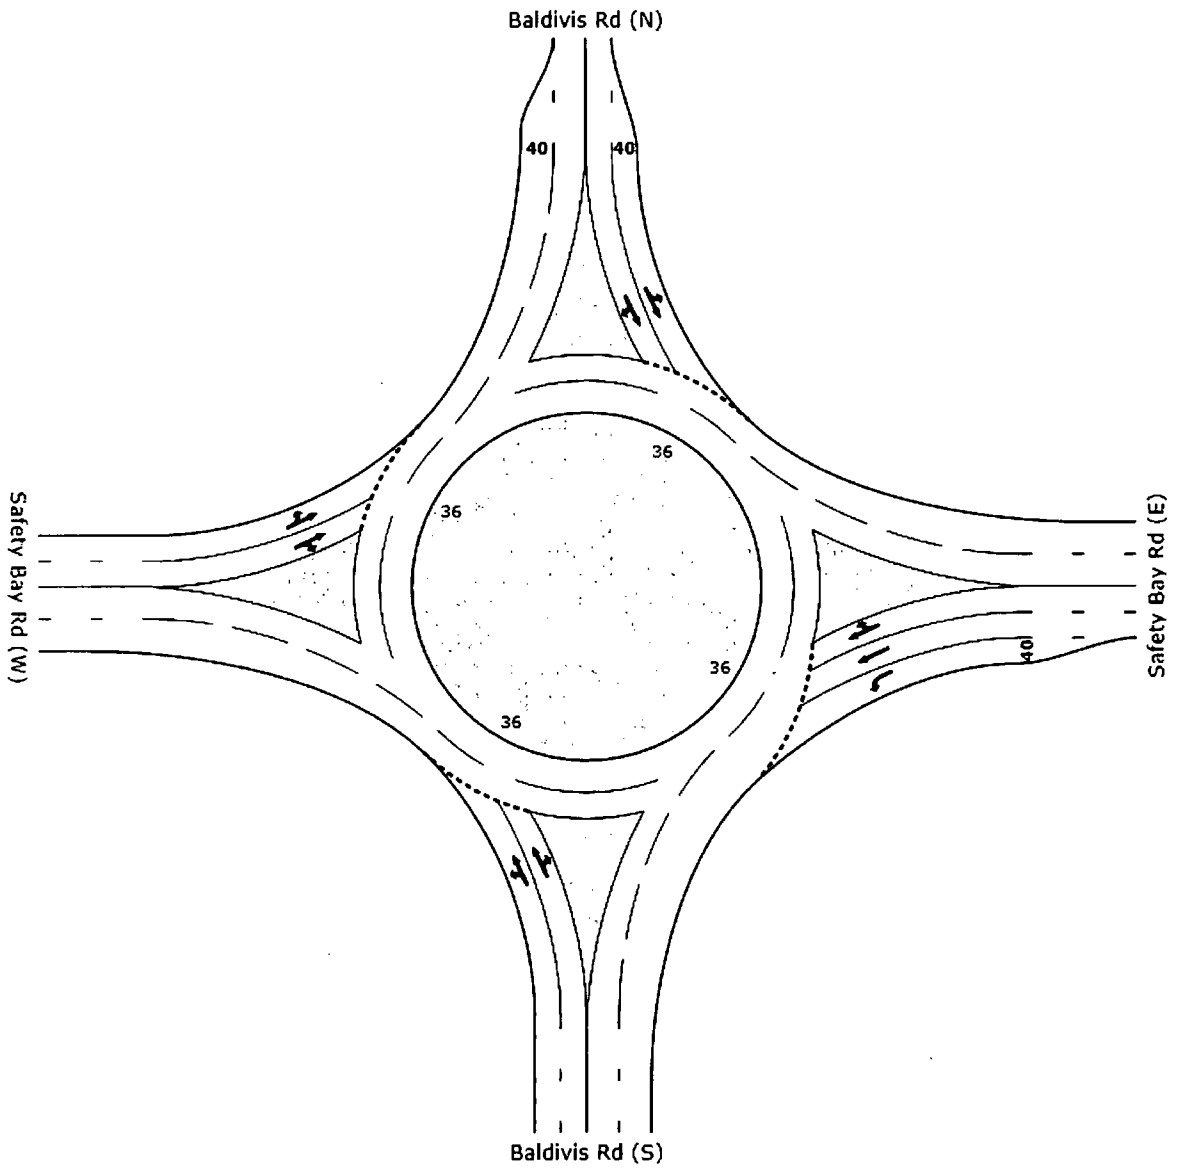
Safety Bay Road / Baldivis Road roundabout layout (widened)
